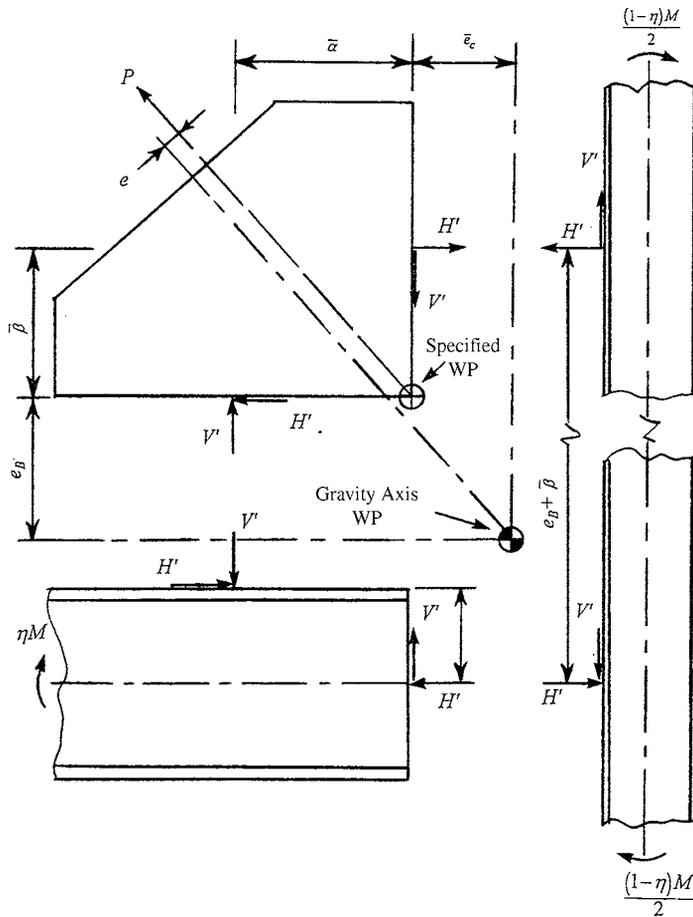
Vertical brace connection with nonconcentric workpoint. (Source: A. R. Tamboli, Handbook of Structural Steel Connection Design and Details, McGraw-Hill, 1999, with permission.)
